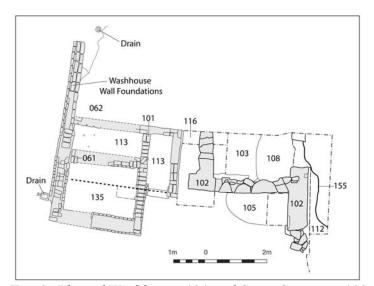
Plan of Washhouse 101 and Stone Structure 102
